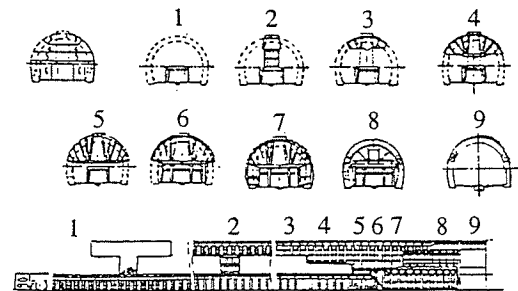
"New Austrian" bottom drift method and Radial beam type timbering..³⁾
